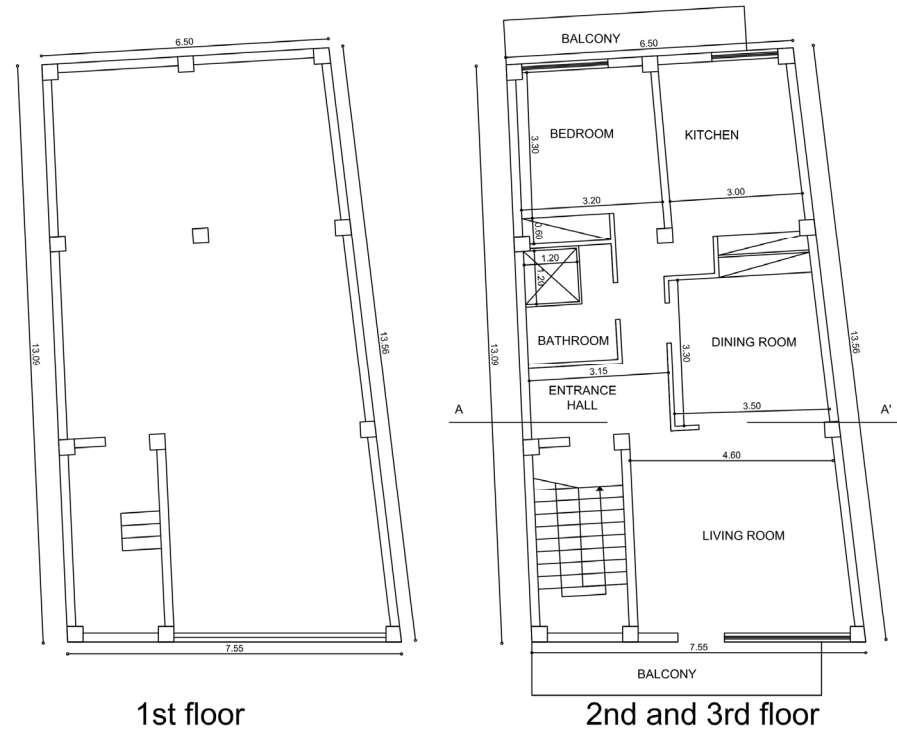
Layout of the r/c building: first (ground) floor (left); second and third floors (right).
